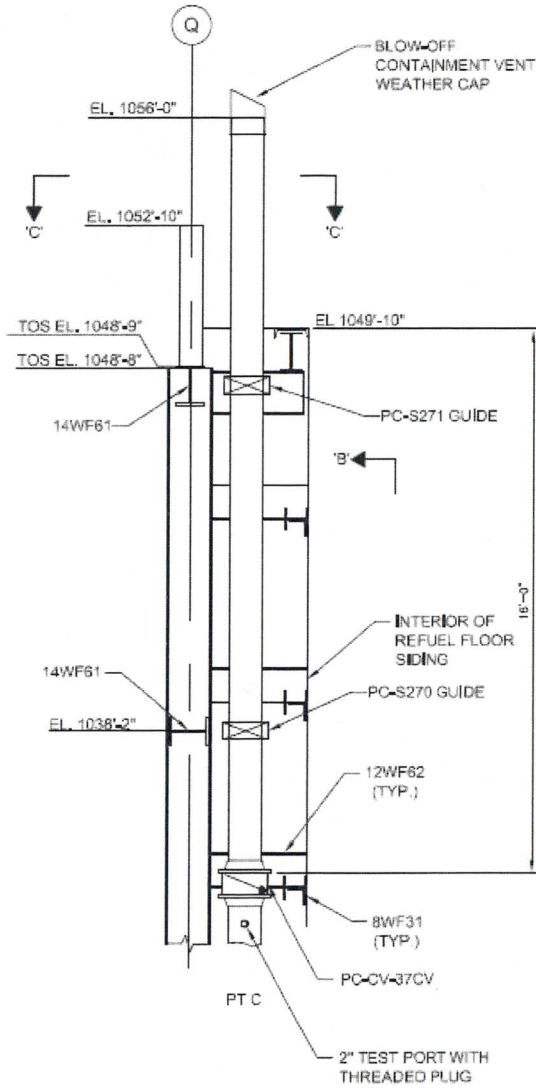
Reactor Building Parapet vs HCVS Pipe Sketch (Reference 59)
